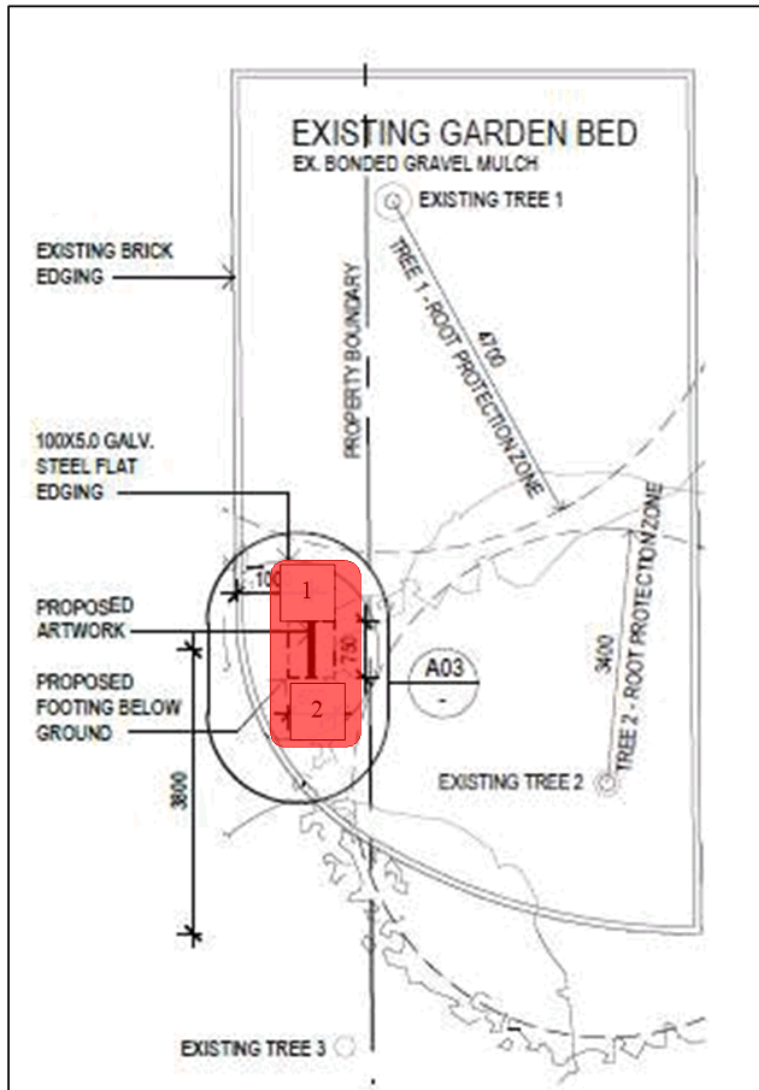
Site Plan on Architect Plan – approximate excavation area illustrated in red, boreholes numbered
